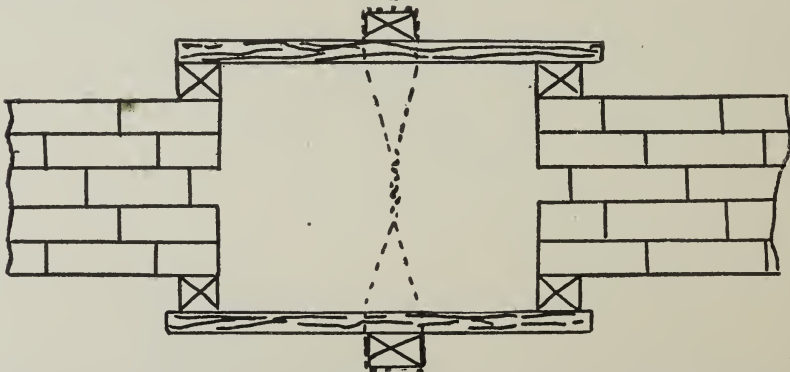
Double Wood Form Shutters for Concrete Column in Brick Party-wall.
